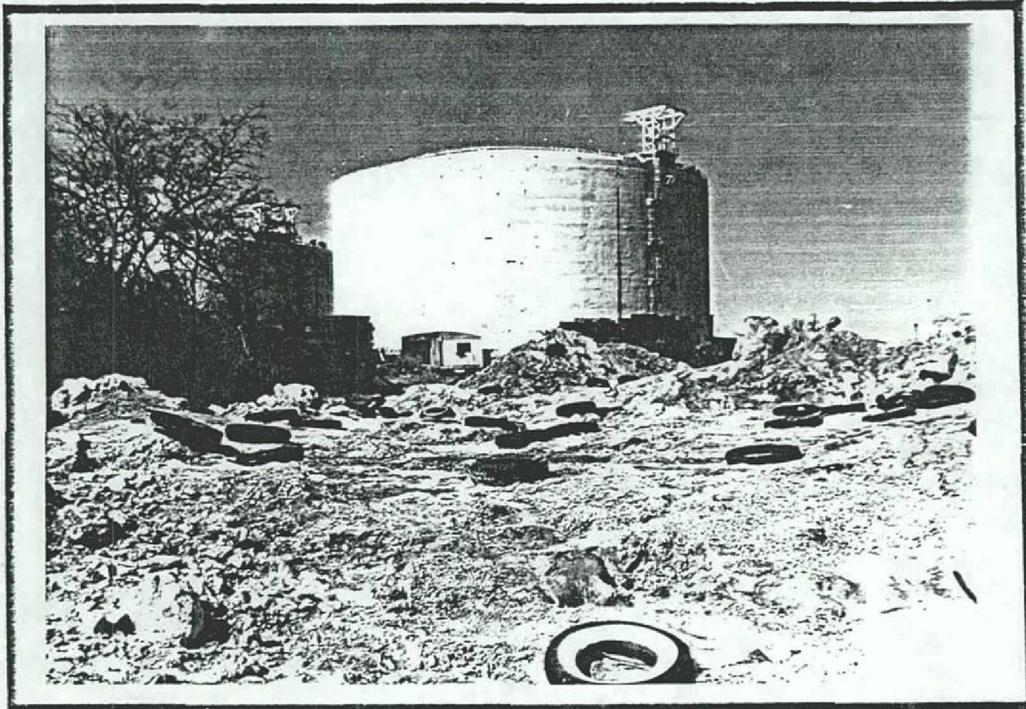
Project Area from No. 2575 Arthur Kill Road, View Looking Southwest
